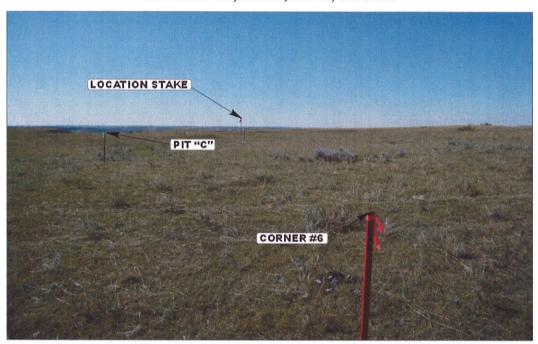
PHOTO: VIEW FROM CORNER #6 TO LOCATION STAKE
